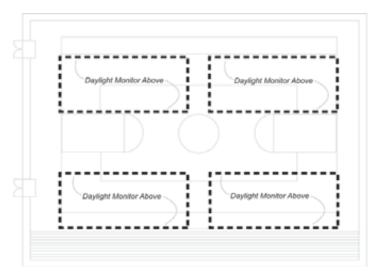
Typical 7600 ft² gymnasium floor plan with four roof monitors.
